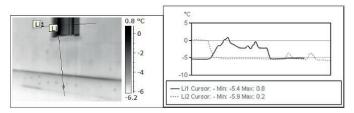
Thermal image of a fragment of elevation of the insulated building and the analysis of a window and basement wall – description in the text
